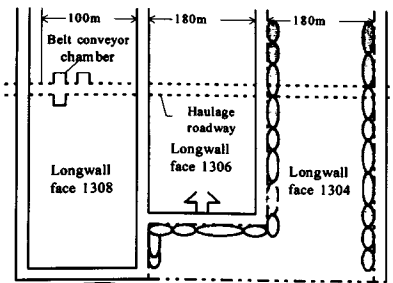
Geometric relations between the haulage roadway and longwall faces.
